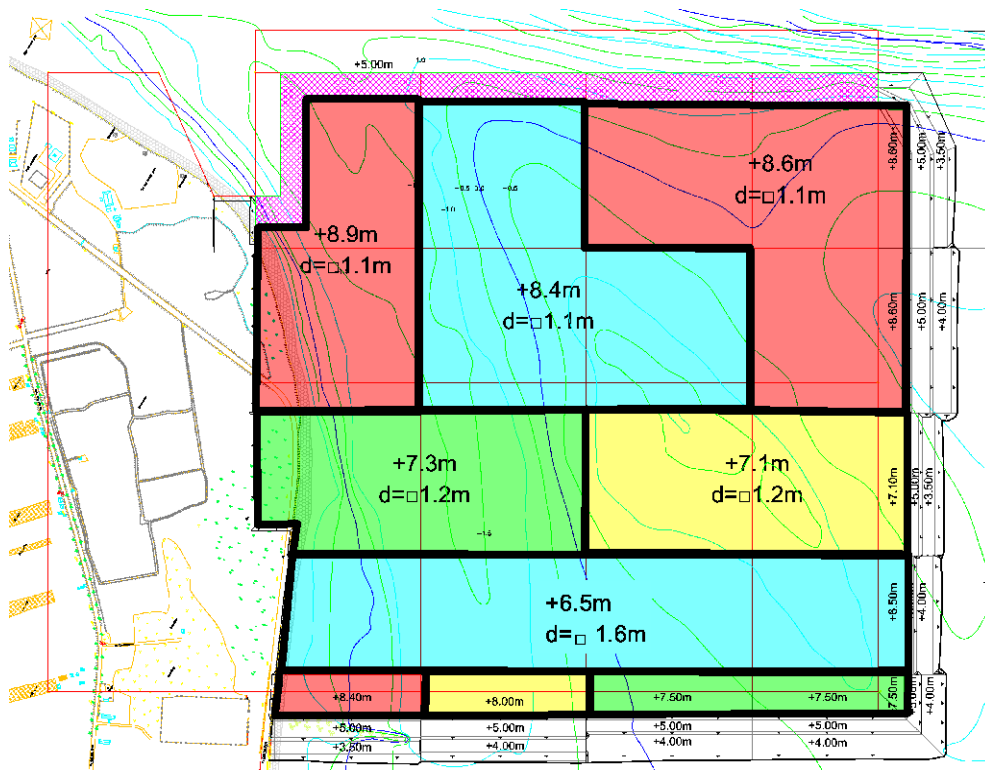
Preload Layout Plan at Reclamation Area including Revetment Area
